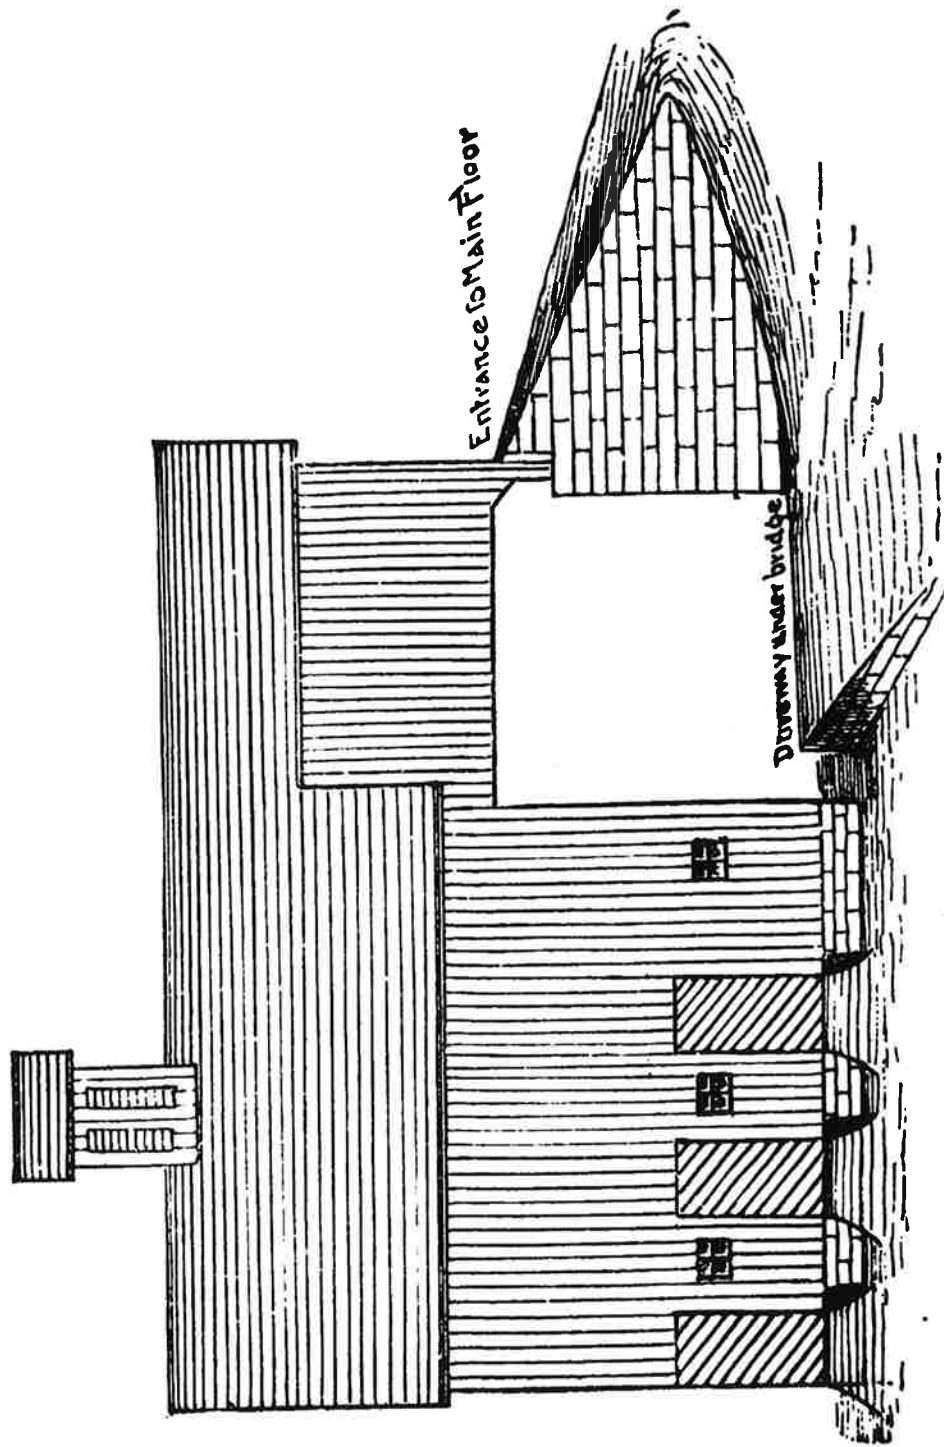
SIDE VIEW OF A HILL-SIDE BARN.
